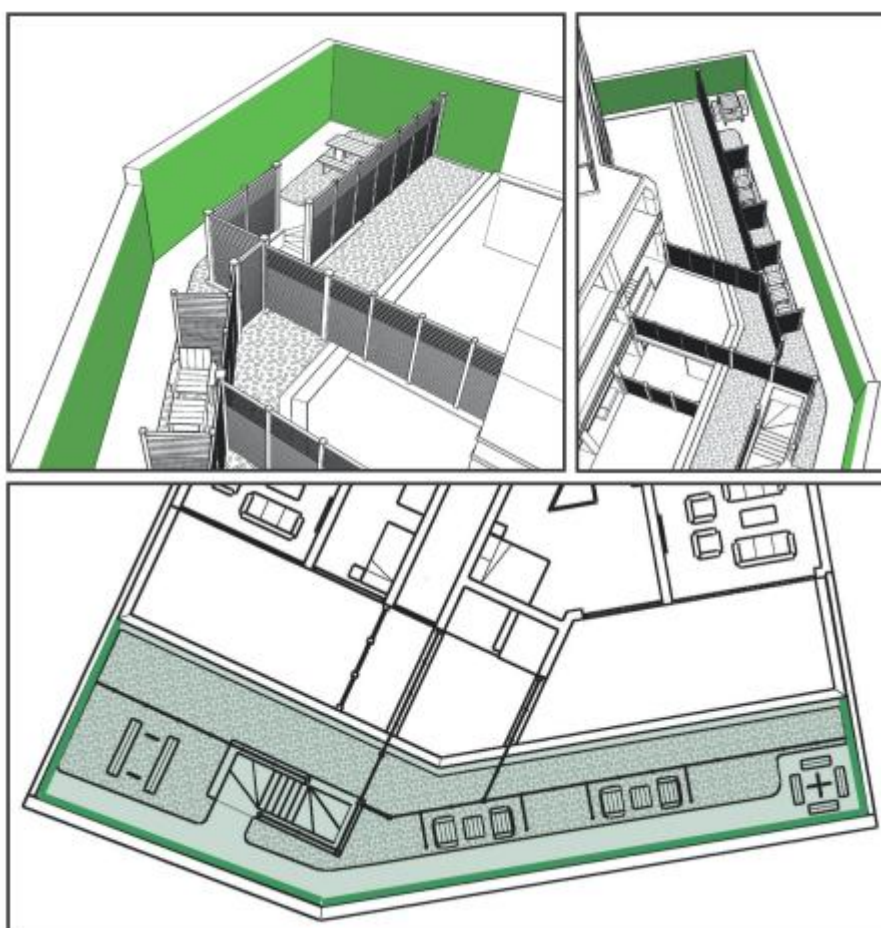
97m<sup>2</sup> of Planted Green Wall Along the Back Garden Wall of the Development
